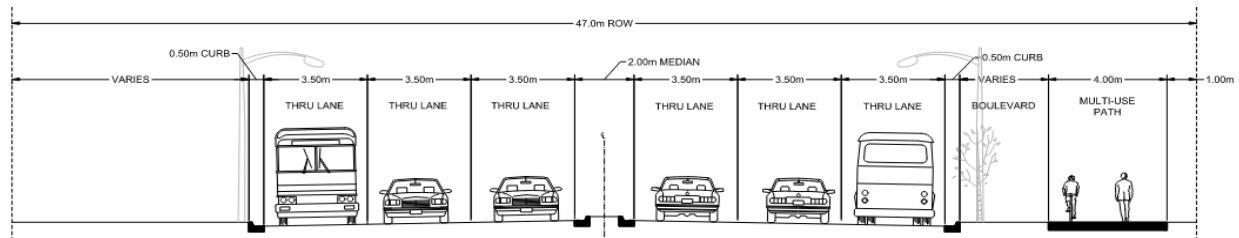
Regional Road 25 Typical Cross Section Between Louis St. Laurent Avenue and Derry Road
